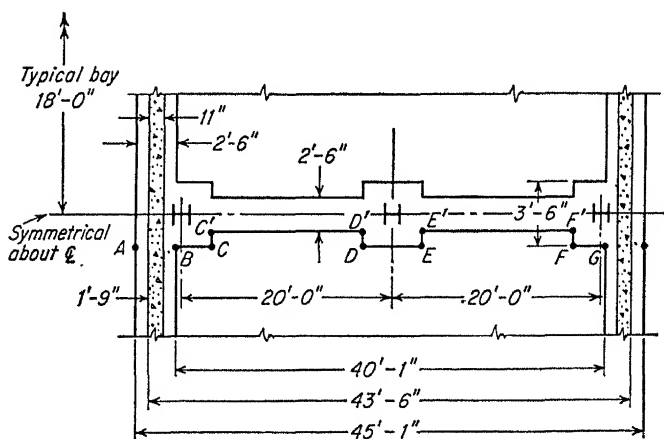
Preliminary foundation plan for one bay [Chap. 1, Ref. 8].
